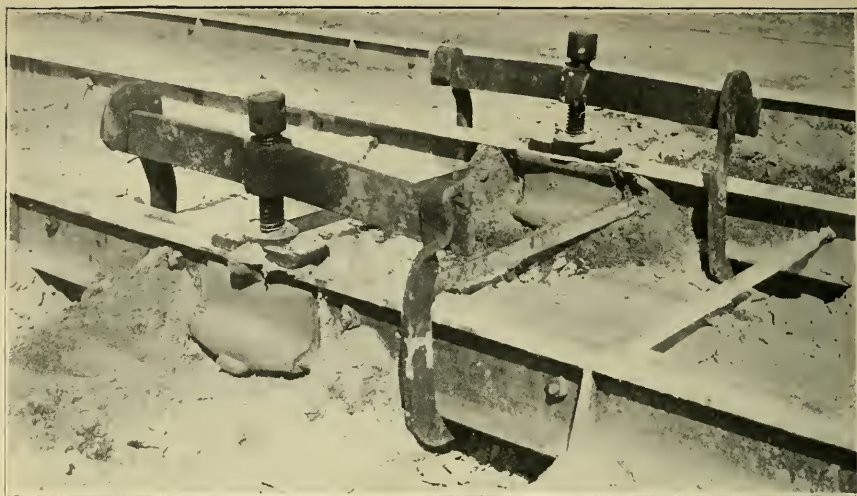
CAST WELD JOINT, BEFORE REMOVING CLAMPS.
